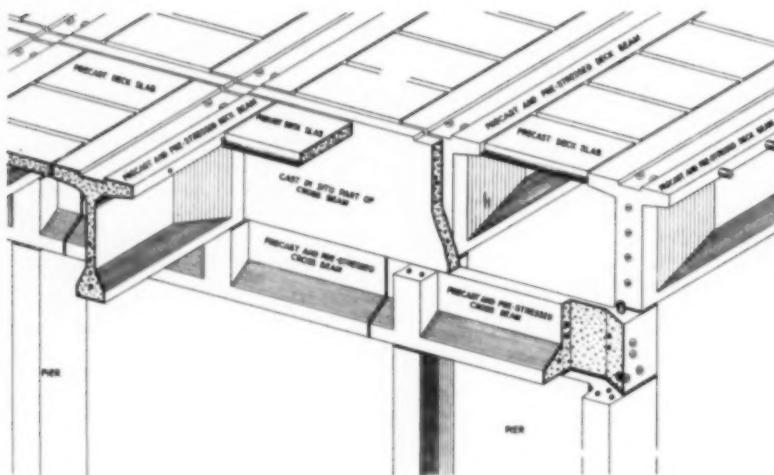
Precast beams and slabs are placed on cast-in-place piers and assembled by vertical, transverse and horizontal prestressing cables.
